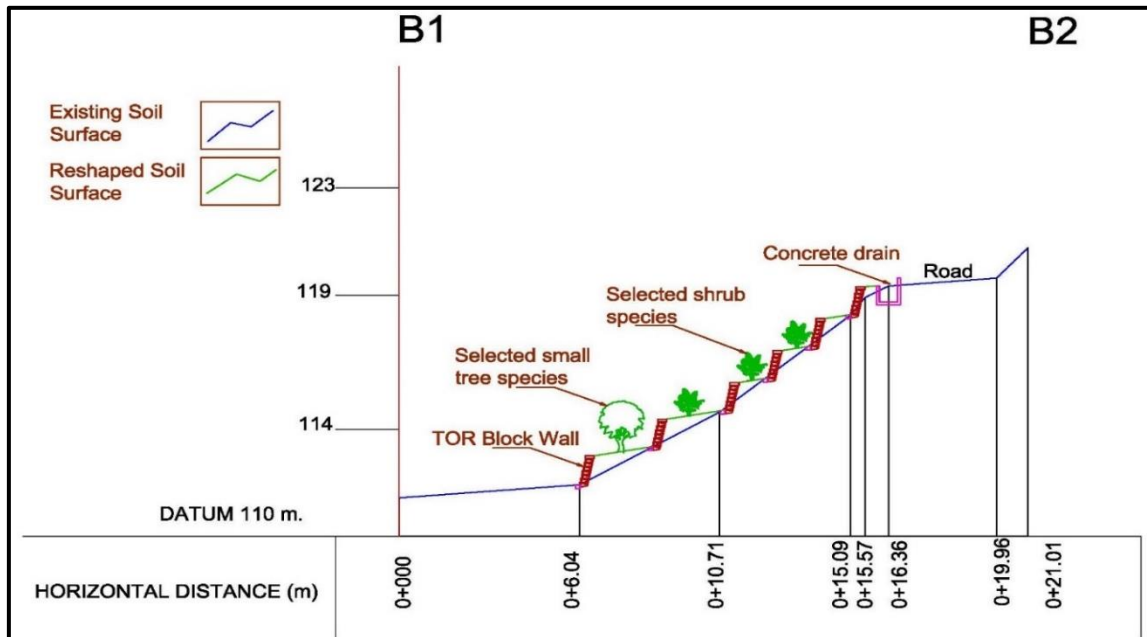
Proposed Tiered Wall using TOR blocks with Bench Plantings
